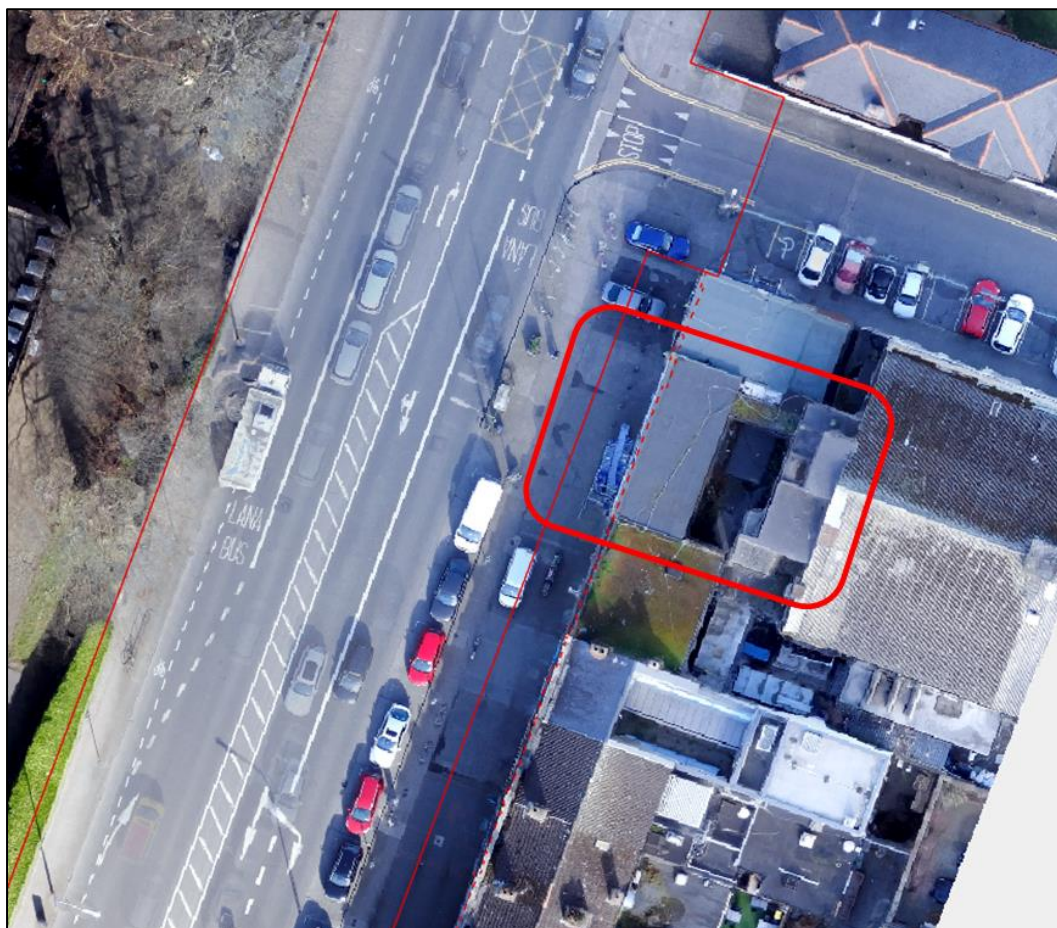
Existing aerial view on Upper Drumcondra Road
